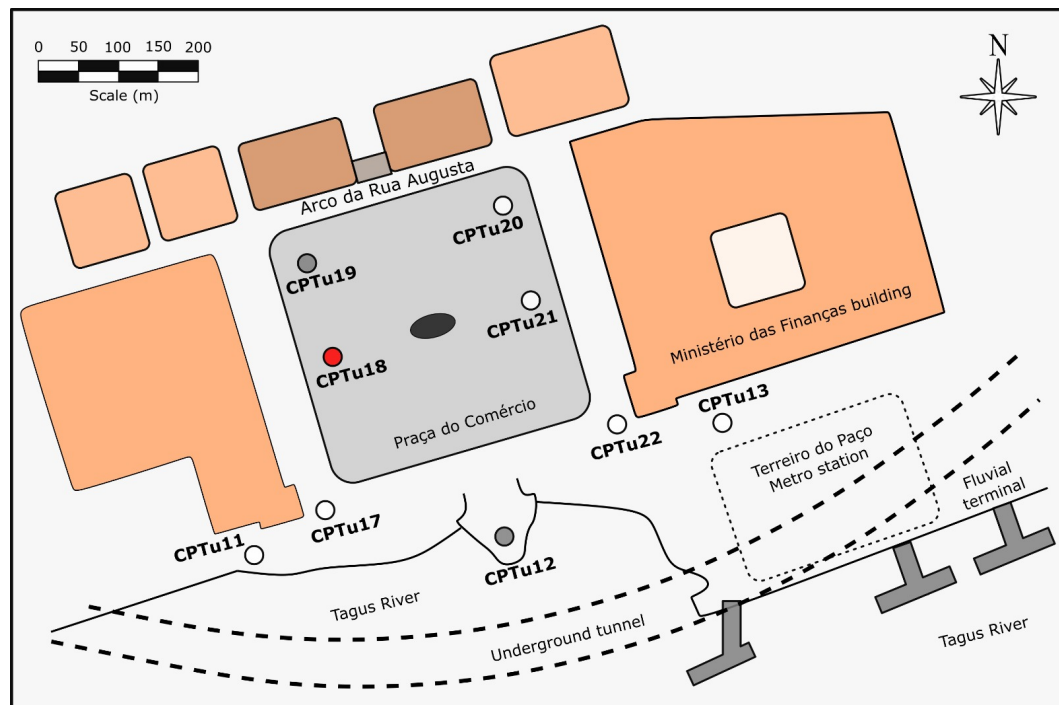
Plan view and CPTu locations at Terreiro do Paço site
